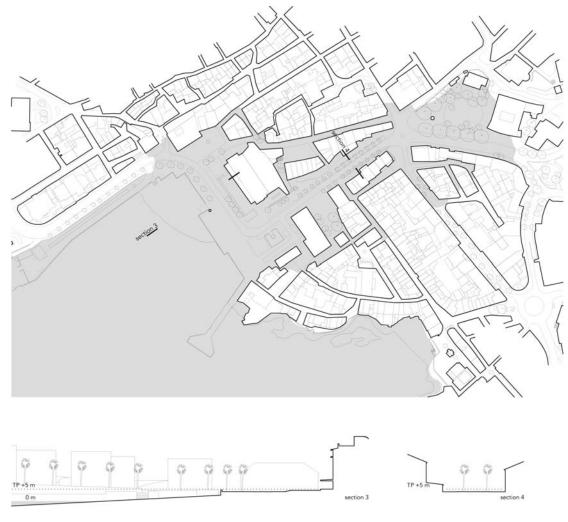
Cascais seashore street. Detail plan (rotated 90^a clockwise) and cross sections considering a +5m sea level rise. Source: (Forma Urbis Lab and Author)
